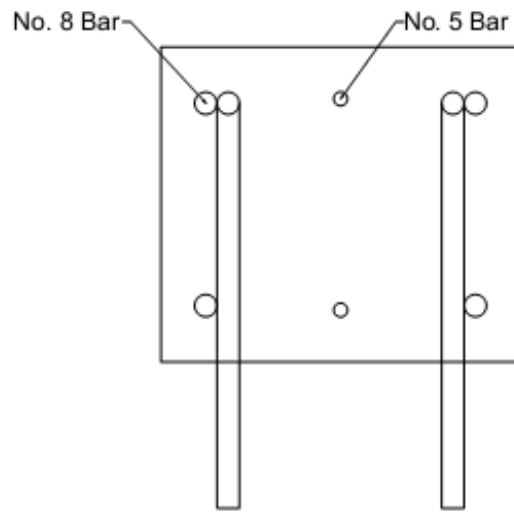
Longitudinal column reinforcement-4 No. 8 bars + 2 No. 5 bars. Transverse reinforcement not shown.
